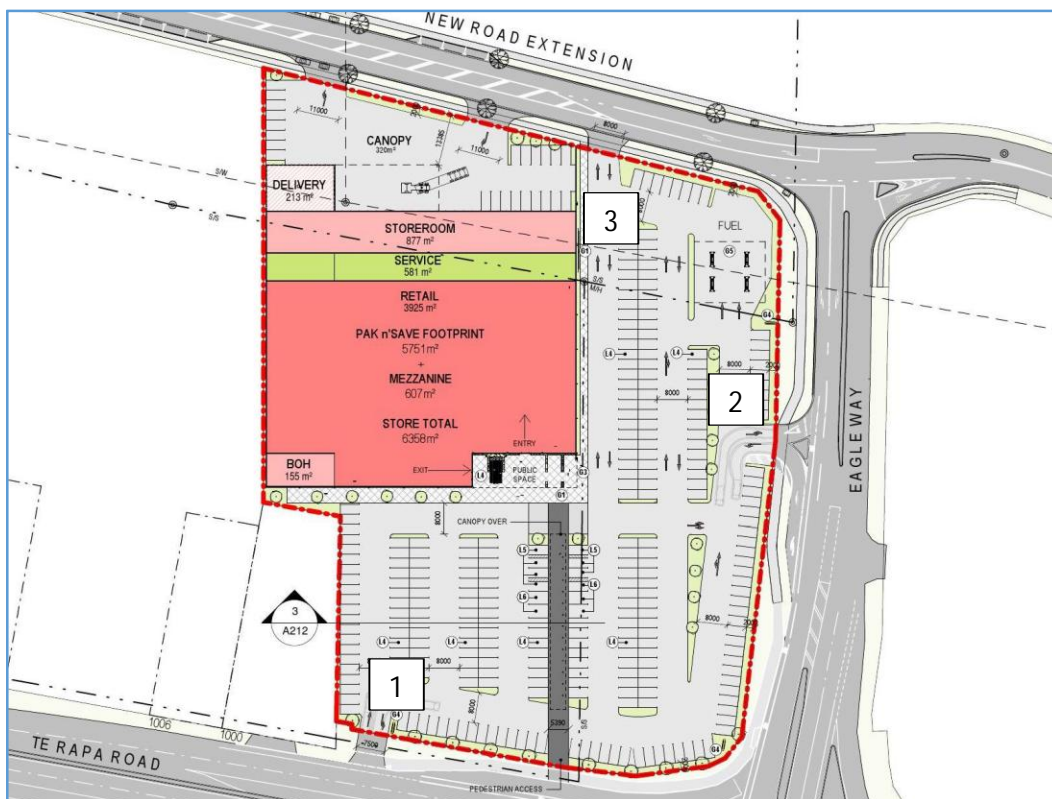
Proposed Pak n Save Te Rapa Access Configuration
